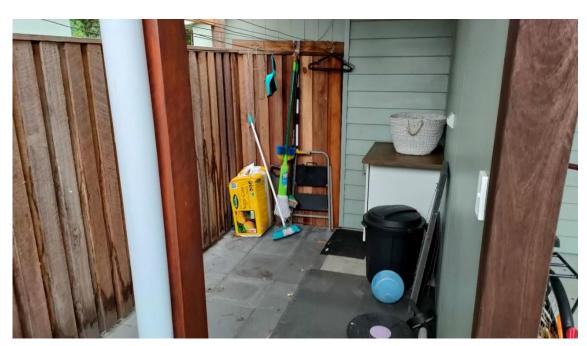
Laundry area shown on plans attached to the carport. Landowner confirmed onsite inspection that laundry fittings have already been removed as required by Council compliance action, a small bench space is retained in the corner.
